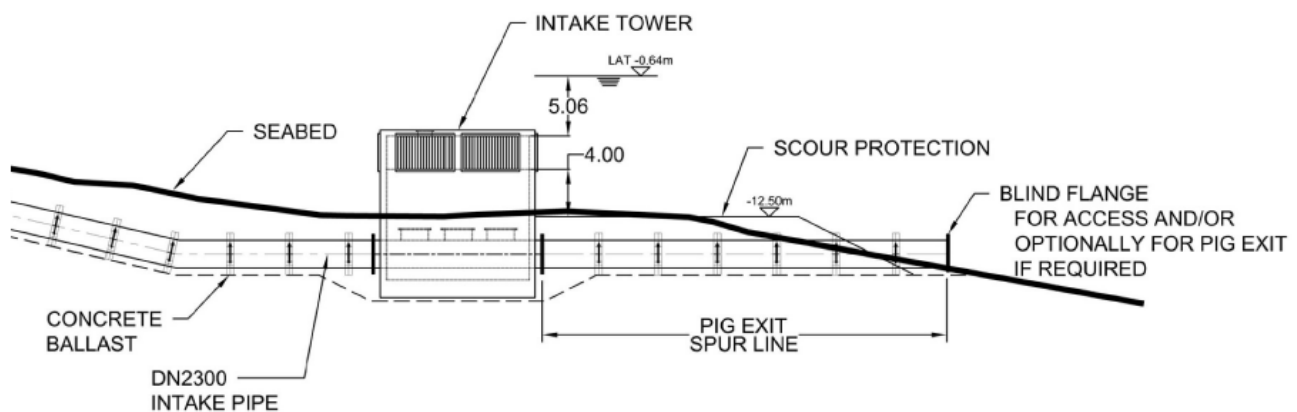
View of Intake Pipeline and Intake Tower (Source: Dar/HR Wallingford, 2021)
